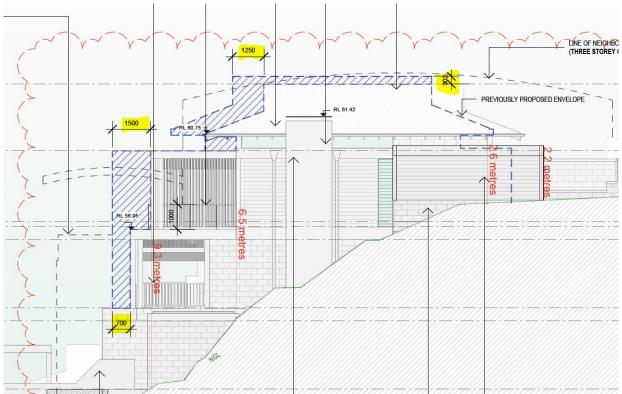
Southern elevation showing the revised plans with increased setback to the western boundary and reduced ridge height of the roof form.
